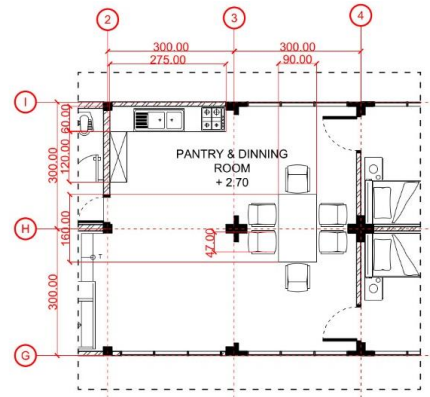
Pantry layout on 1<sup>st</sup> floor in centimeters
